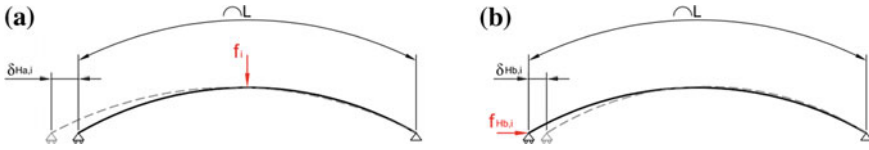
Pin-roller supported arch subject to a vertical and b horizontal point loads
